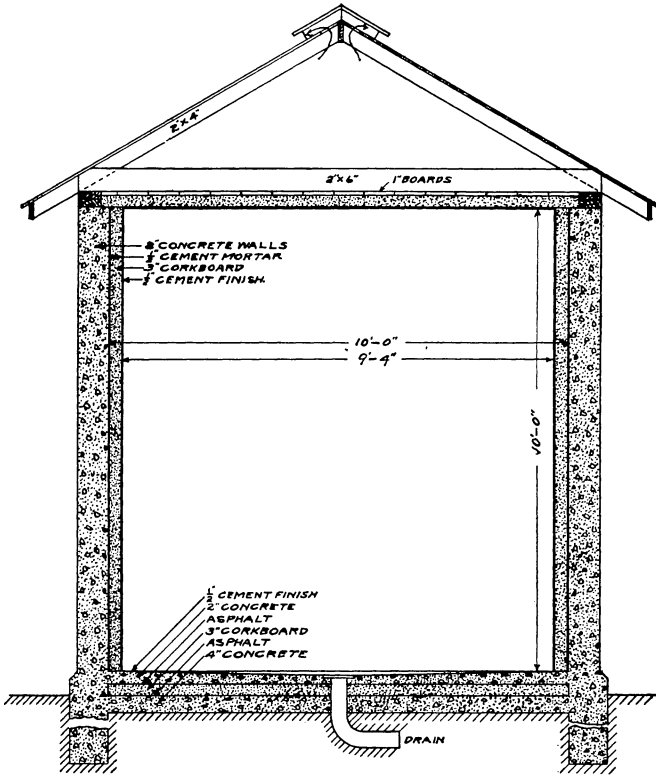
Small concrete ice house. (Section on A-B of fig. 10a.)
